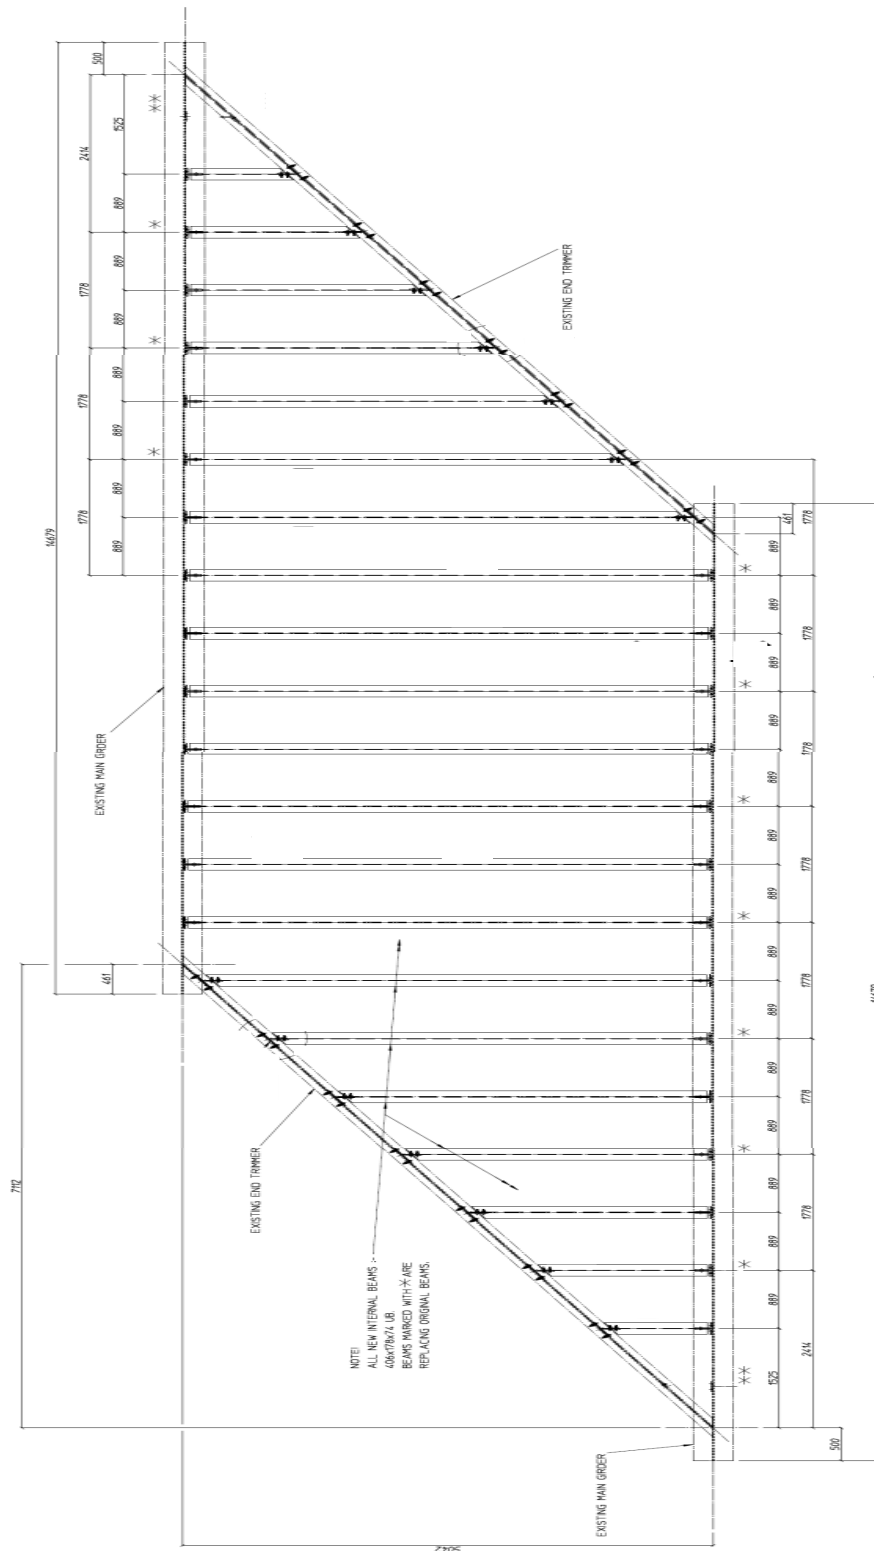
Plan schematic of the Mineral Line Bridge (units in millimetres) (WSR).
